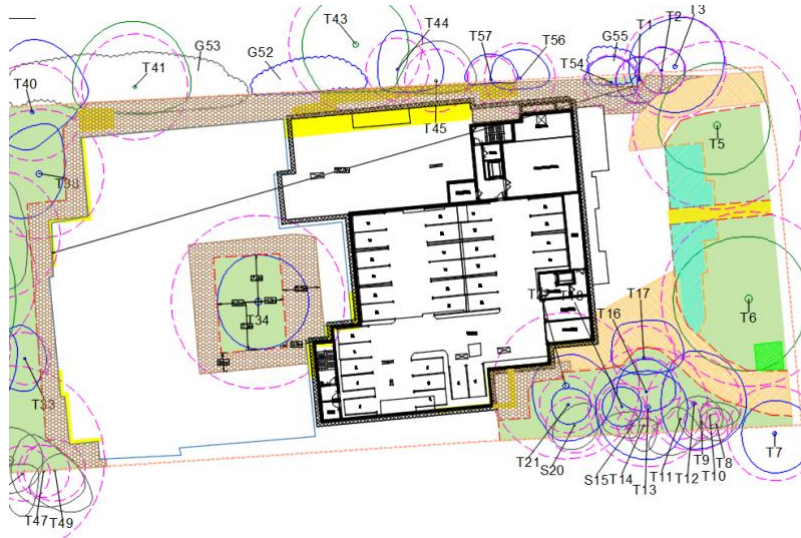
Areas highlighted yellow for basement, building, light structure and retaining wall construction supervision; green for the substation adjacent to T6.
